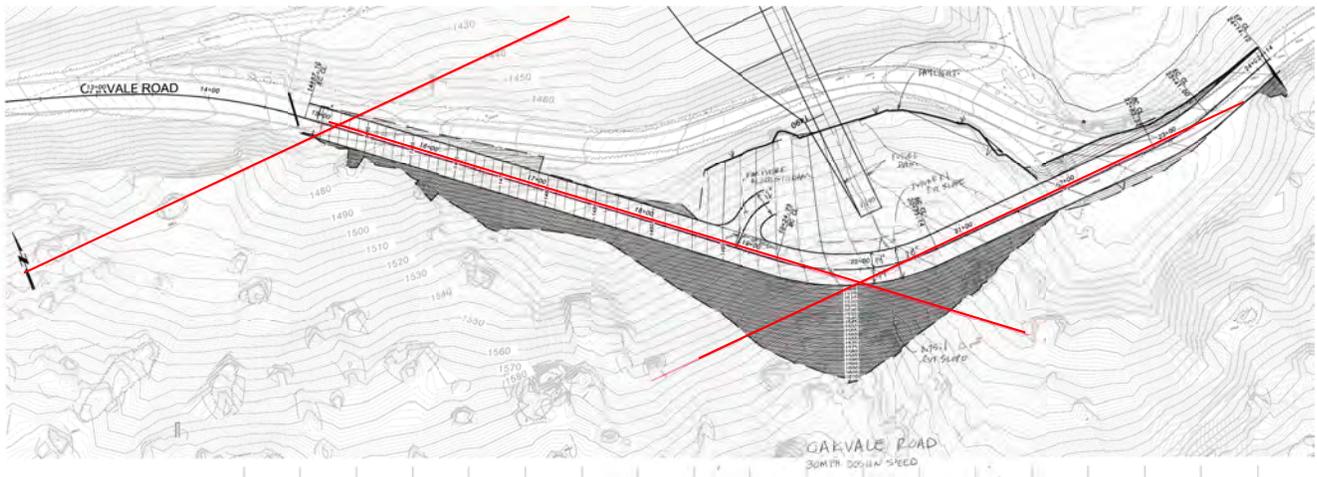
Road Orientations with 0.75:1 Road Cut
